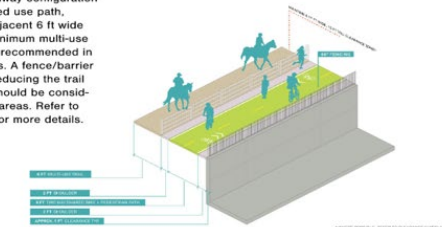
19-ft wide greenway cross section Option B example from Table 5-1
